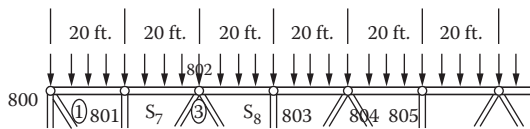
Loads acting on the top chord of the main transverse deck truss supporting the top and cellar decks.
